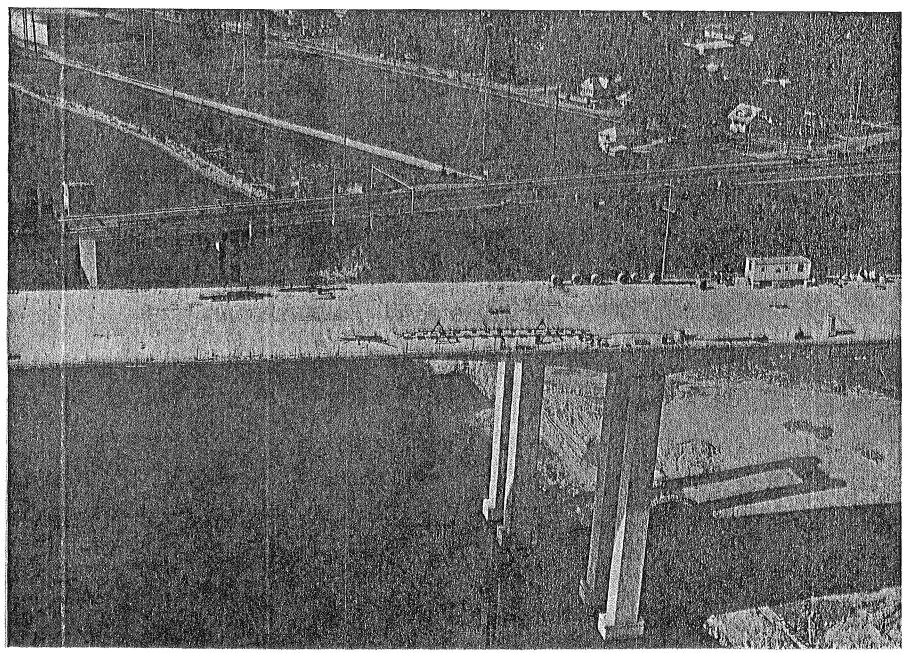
Aerial view of Span 13, Pier 13N and Span 14
